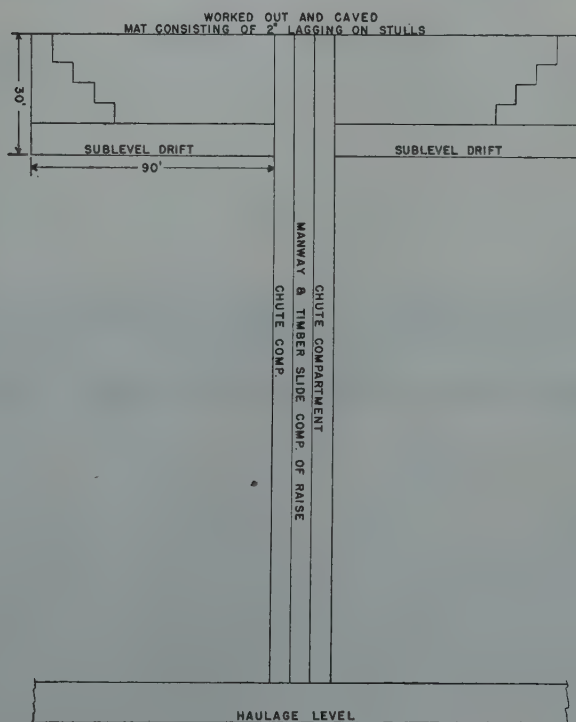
Long section of raise and sublevel stopes on hanging-wall bed at Conda, Idaho.
